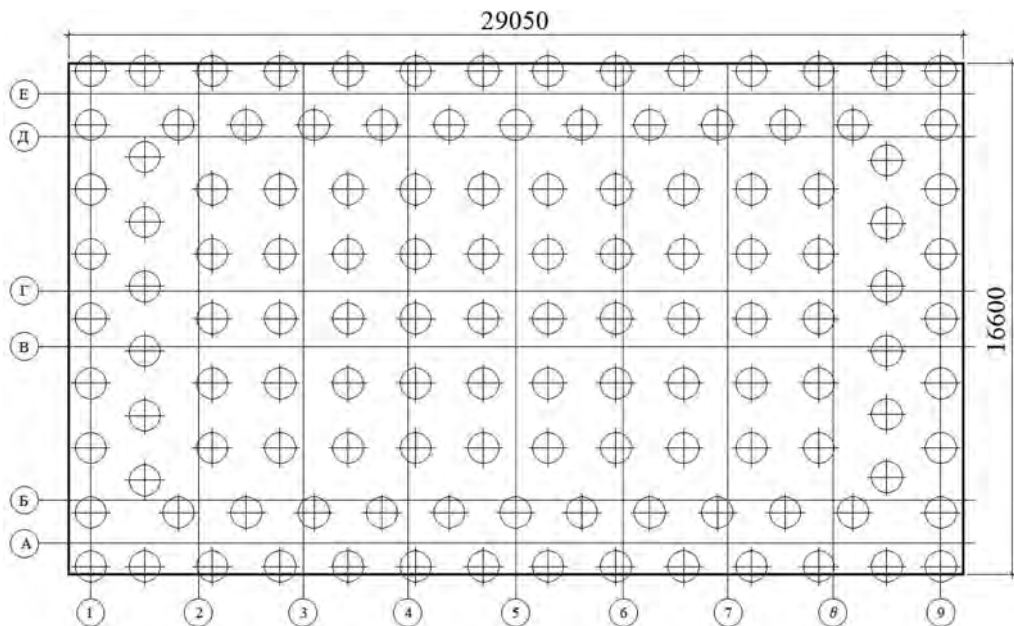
DSM layout, 126 DSM columns, average design pressure under the foundation slab: 398 kPa.
